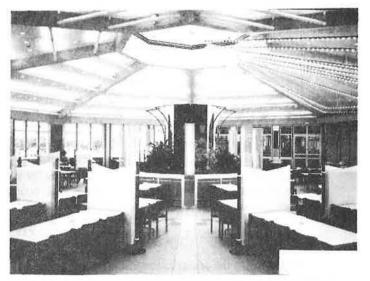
Air outlets in heat-source ventilation systems at the parapet and the center of a hall with a diameter of 28 m (Fitzner).
